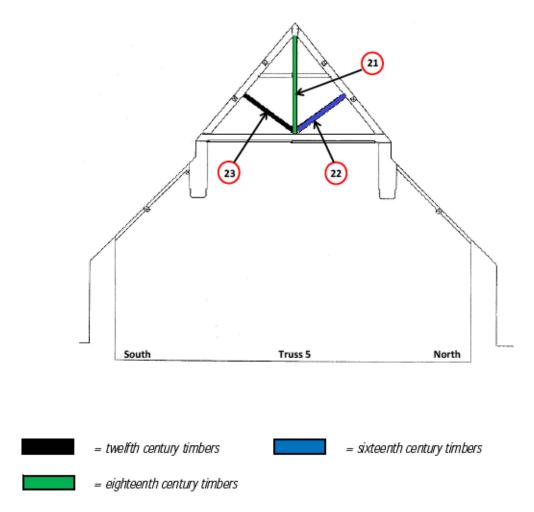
Cross section of trusses to show sampled timbers (after Nick Hill)
